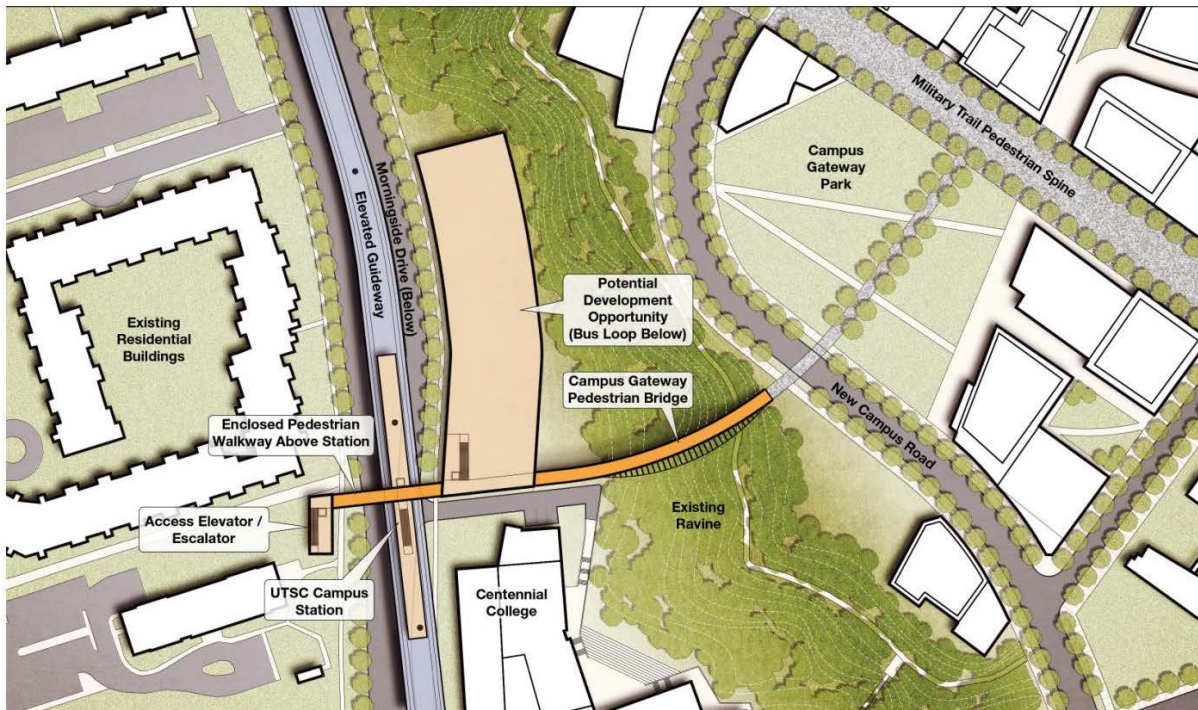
Morningside Elevated - Centennial College stop and north campus connection
